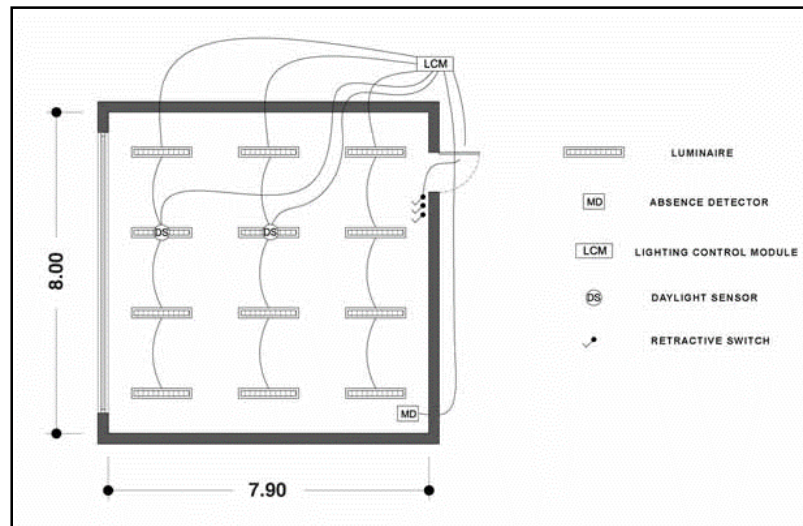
Plan view of classroom with luminaires perpendicular to the window, complete with switching arrangement [41]
